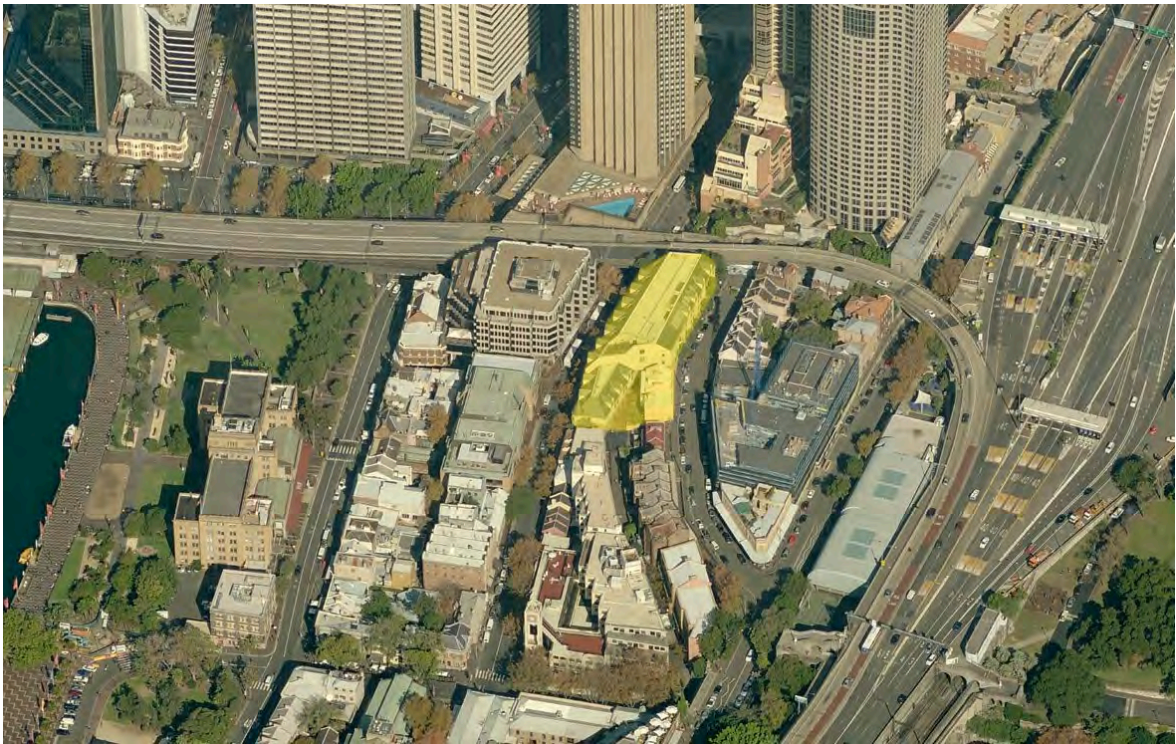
Project site (yellow shading) viewed from north with the Bradfield Highway (right side) and Cahill Expressway
